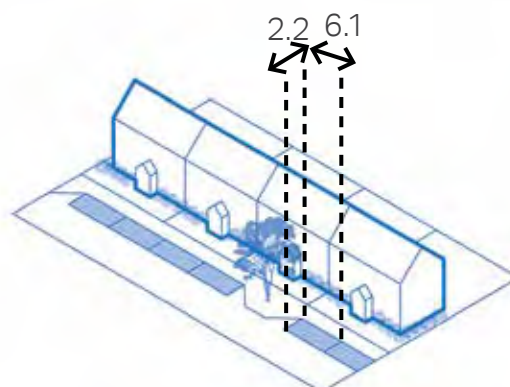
Illustrative diagram showing an indicative layout of on-street parking.
